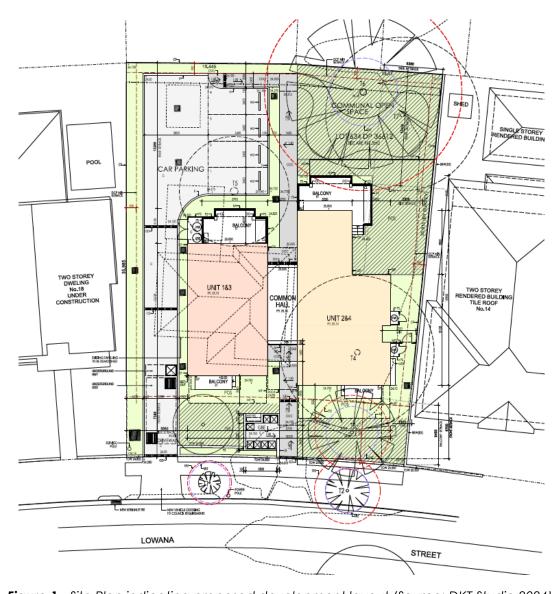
Site Plan indicating proposed development layout (Source: DKT Studio 2024).
